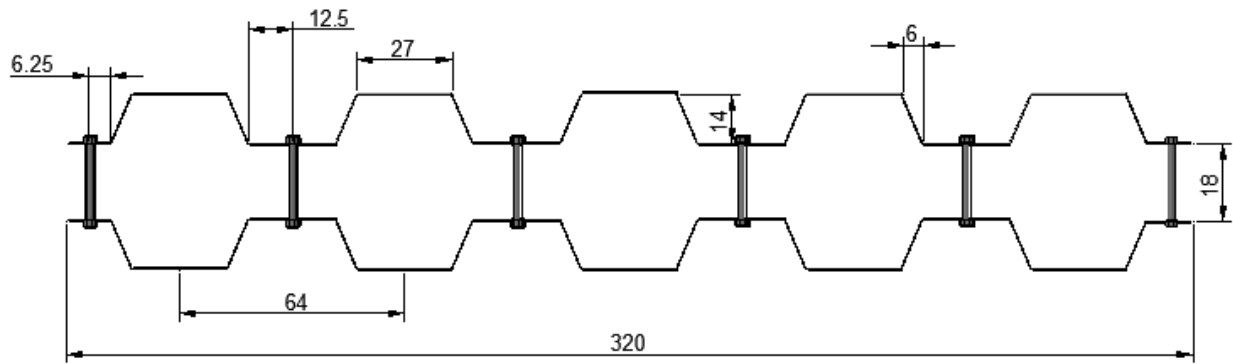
Cross section of steel sheeting wall (dimensions in mm)
